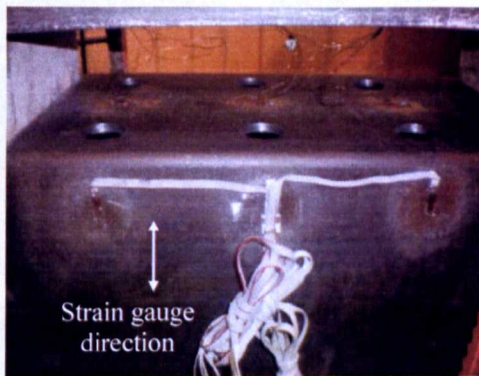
Photograph of strain gauge pattern on tube sidewall face
